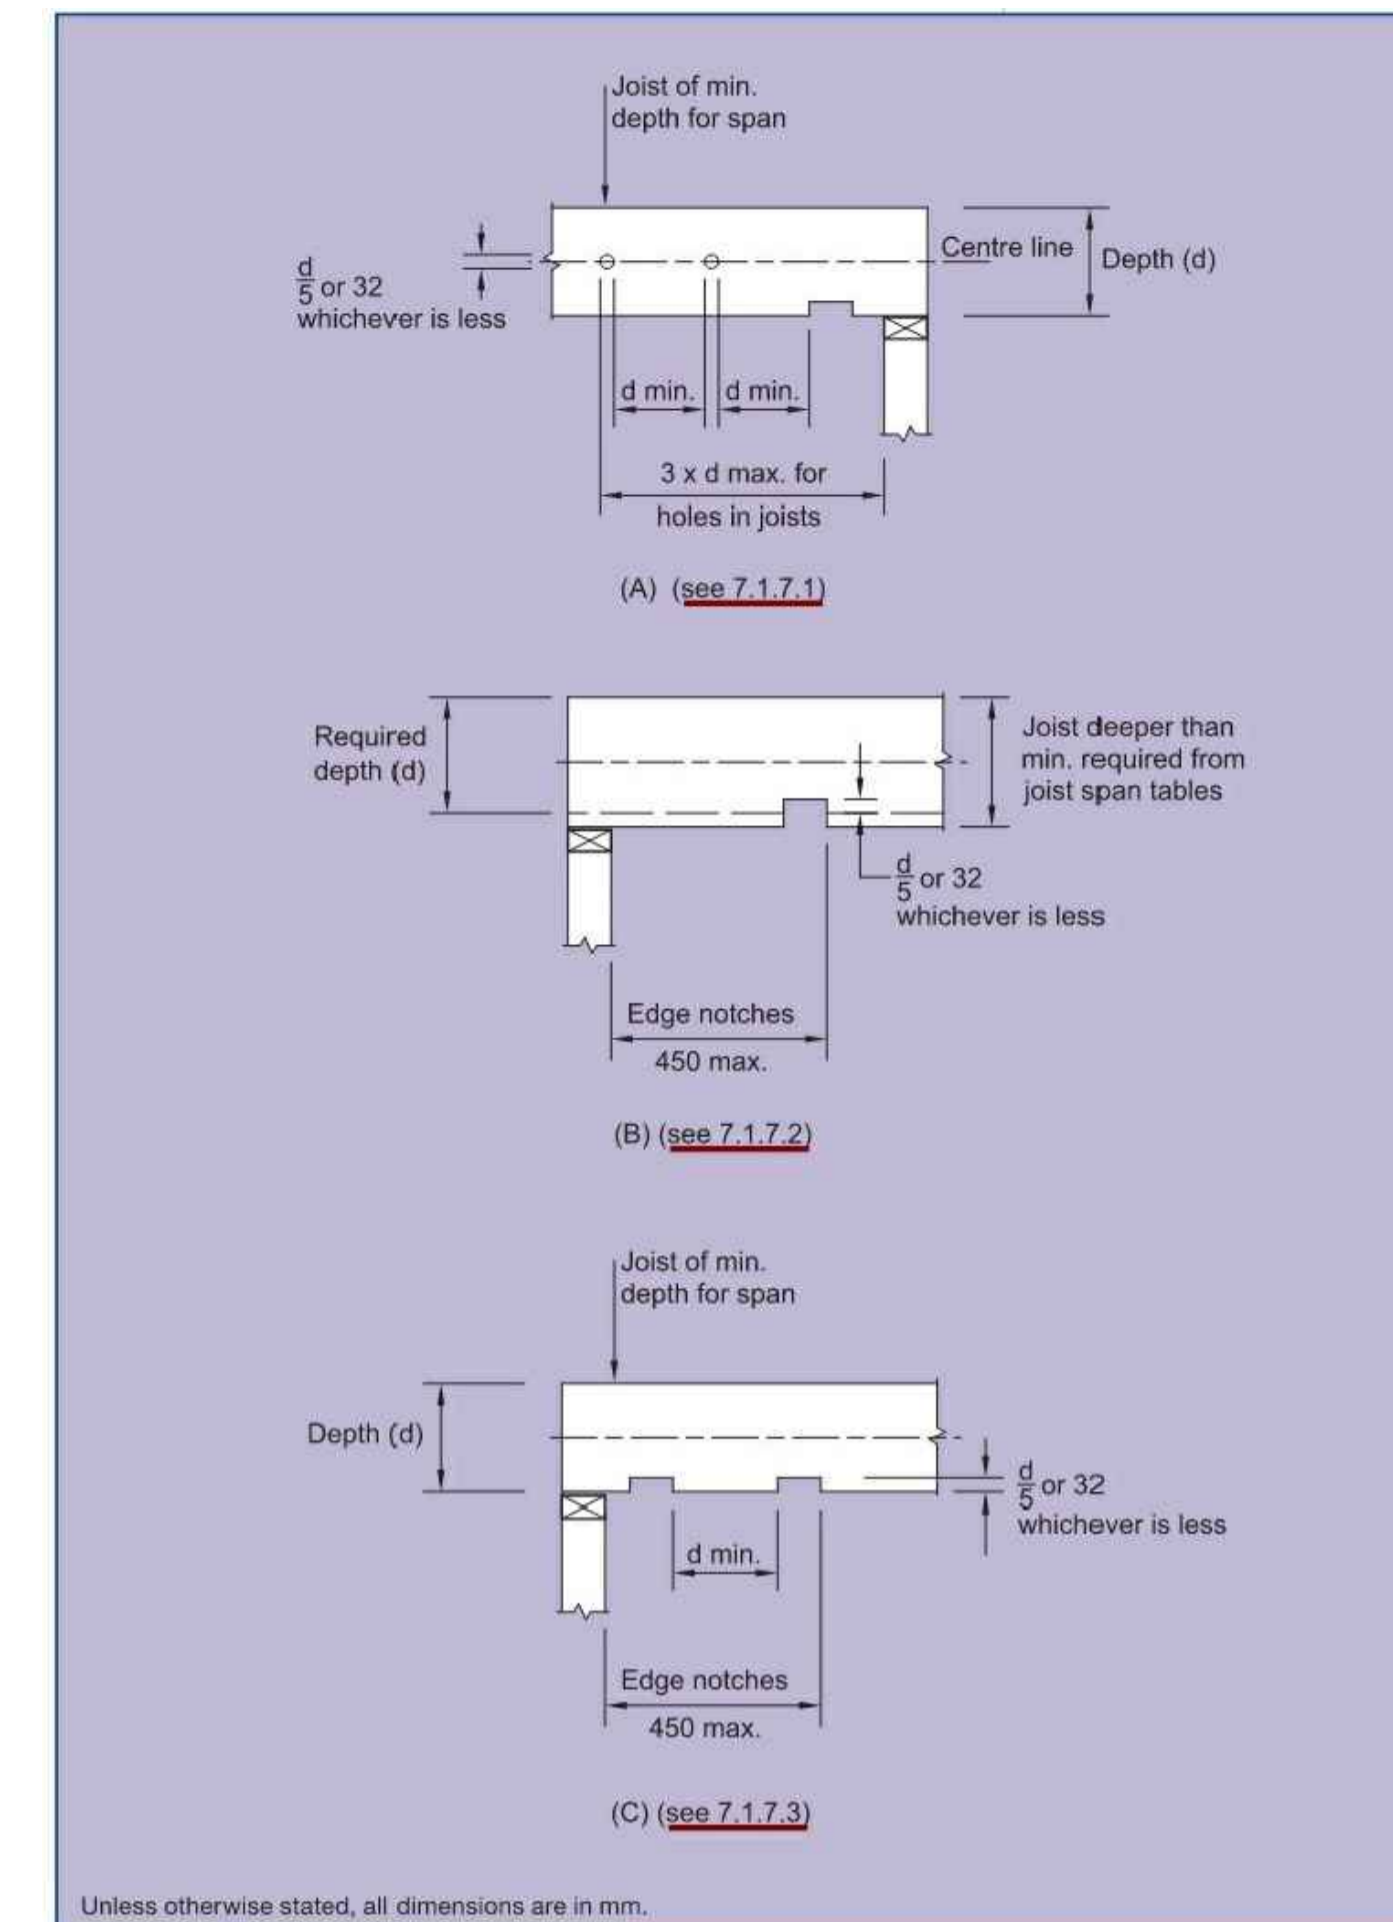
Holes and notches in floor joists other than cantilevered joists (see 7.1.7)
